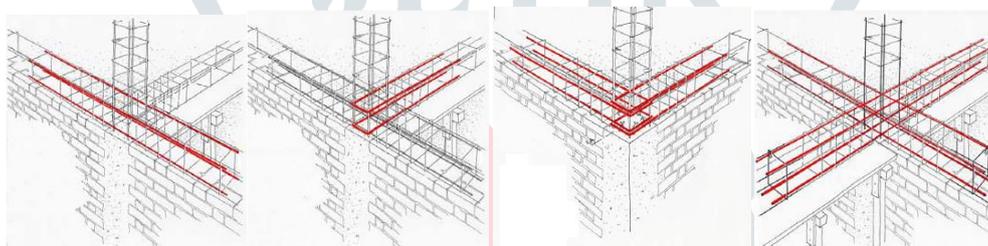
Connect bond beams to columns with straight rebars and pins (Ref. Confined Masonry⁵)
